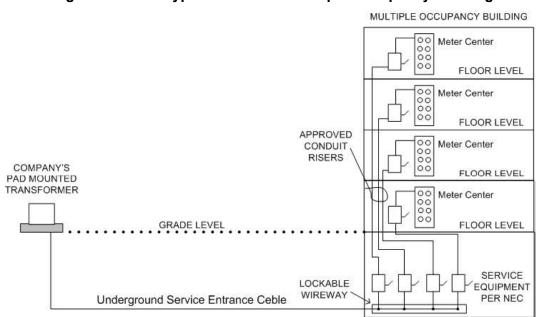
Typical Service to Multiple Occupancy Building
